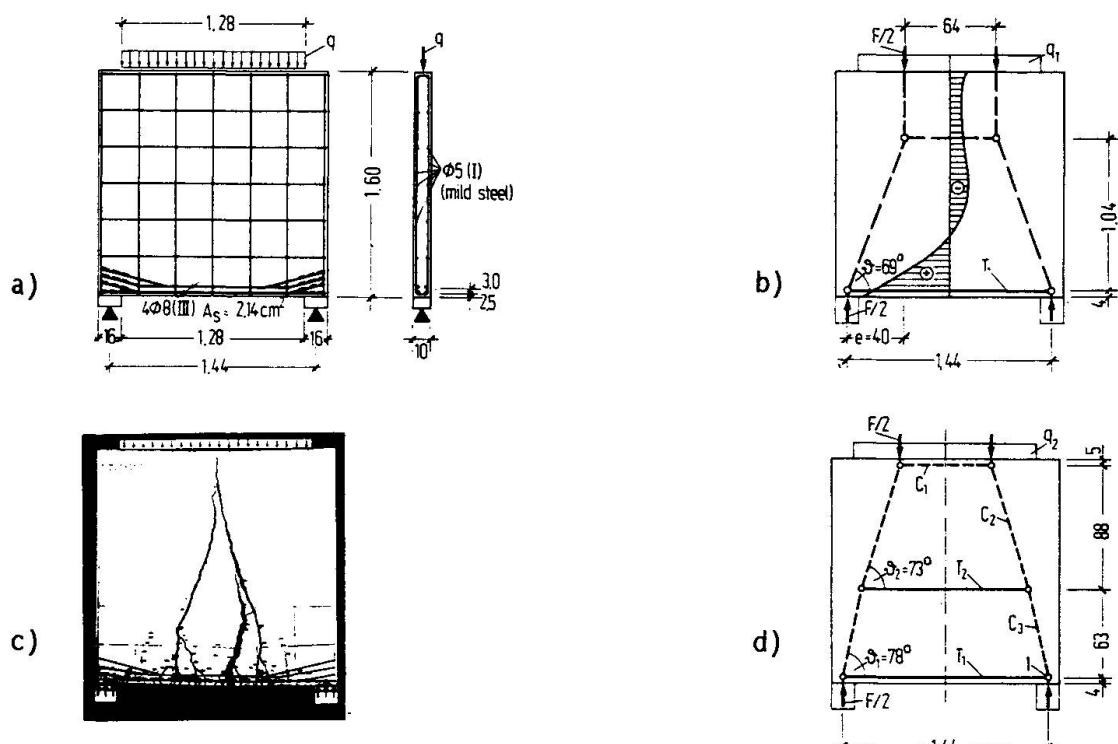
Deep beam: (a) Tested specimen WT2 /16/; (b) model oriented at the theory of elasticity; (c) crack pattern from test; (d) model adjusted to the failure mechanism.
